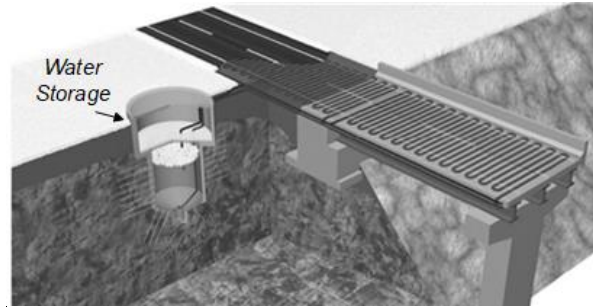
Hydronic heating system using underground water storage on a mountain road in Japan (Yoshitake et al., 2011)
